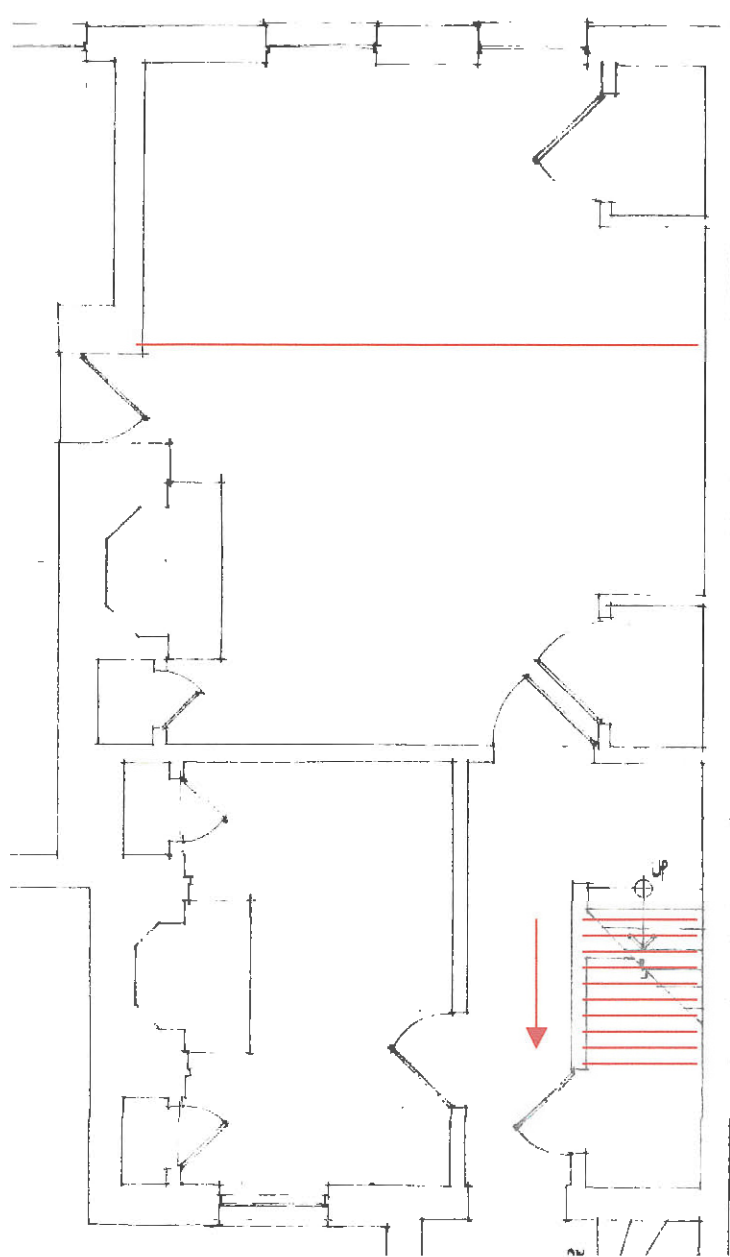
, The second floor of the Adam Barr House. The heavy black lines indicate the house's early nineteenth century dimensions and likely floor plan.
